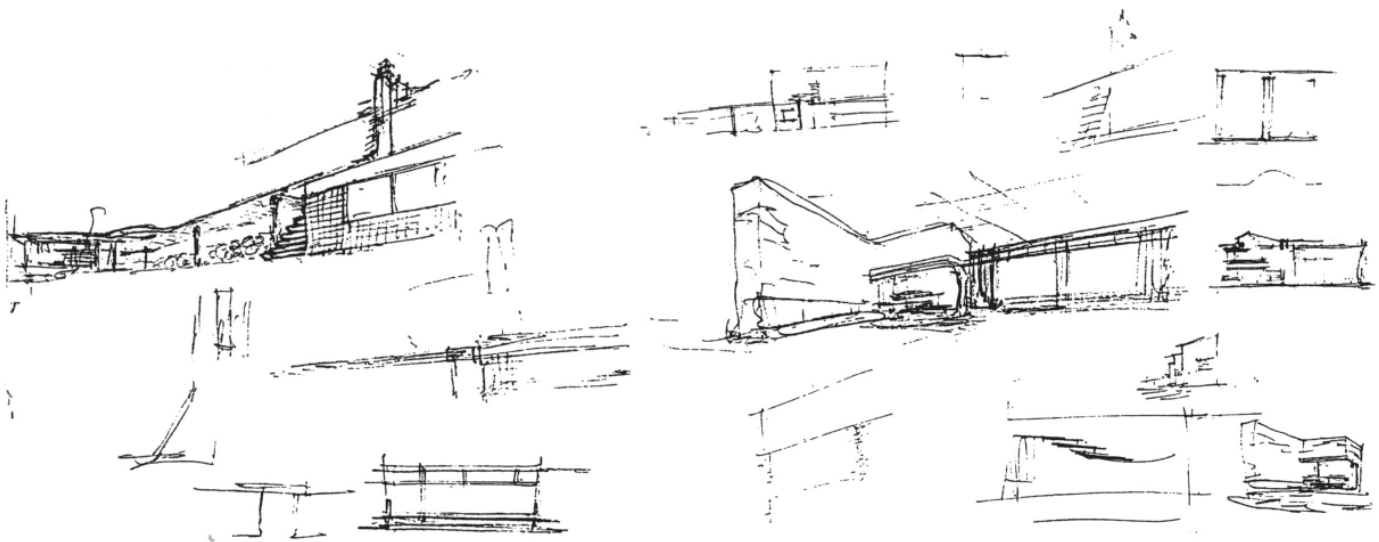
Detailed sketches of dining room, living room fireplace, and sauna terraces
